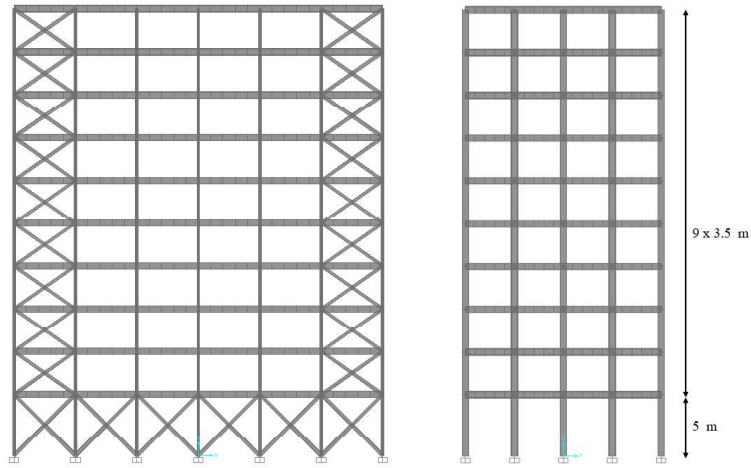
The elevation views of the 10-story steel structure with 1026 members.
